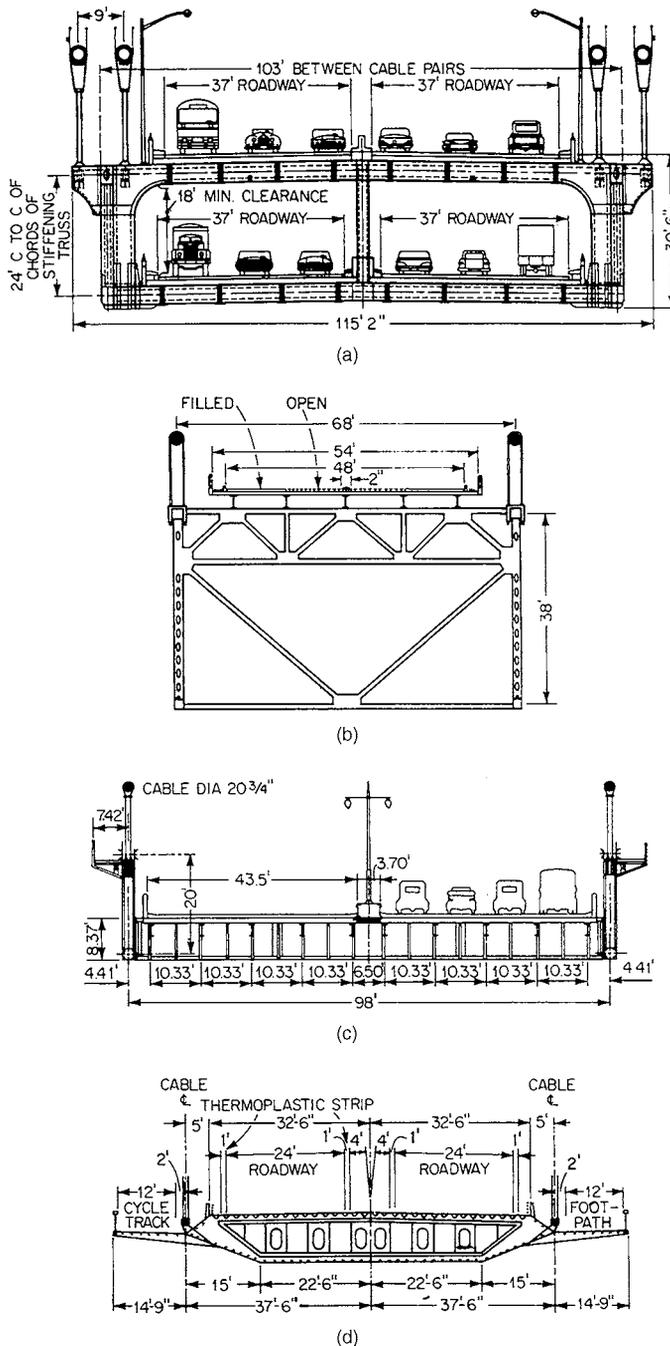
Typical cross sections of suspension bridges. (a) Verrazano Narrows. (b) Mackinac. (c) Triborough. (d) Severn.
